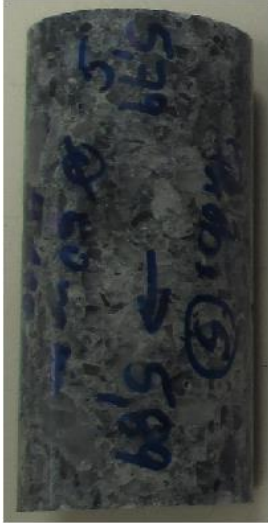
Example of a salt concrete specimen used by GRS in the laboratory tests
